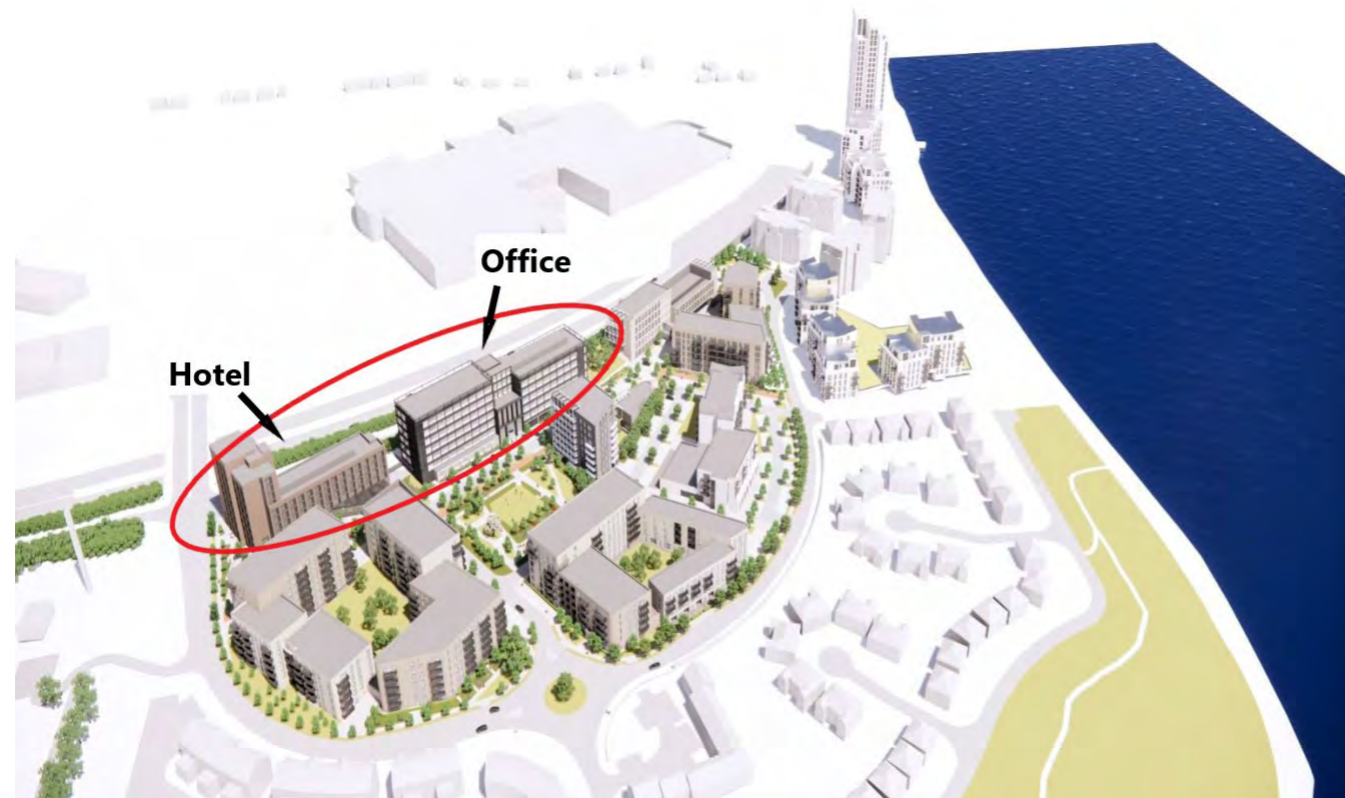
Proposed full masterplan with the Hotel and Office section highlighted
